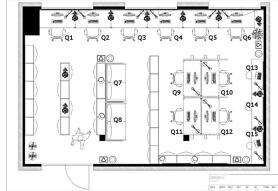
Floor plans of IR and QR with descriptive codes.
